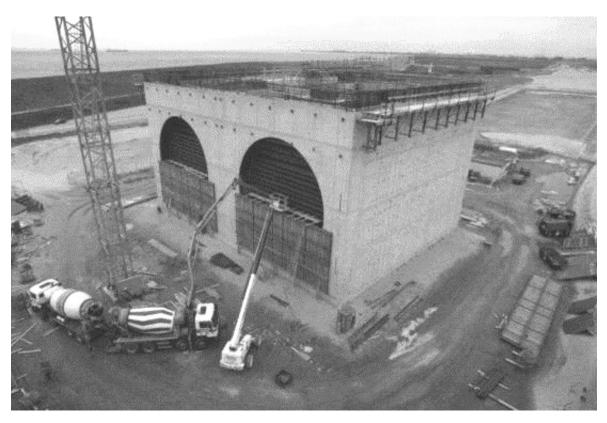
Entrance shaft of the Westerschelde tunnel constructed as a caisson at ground level)
